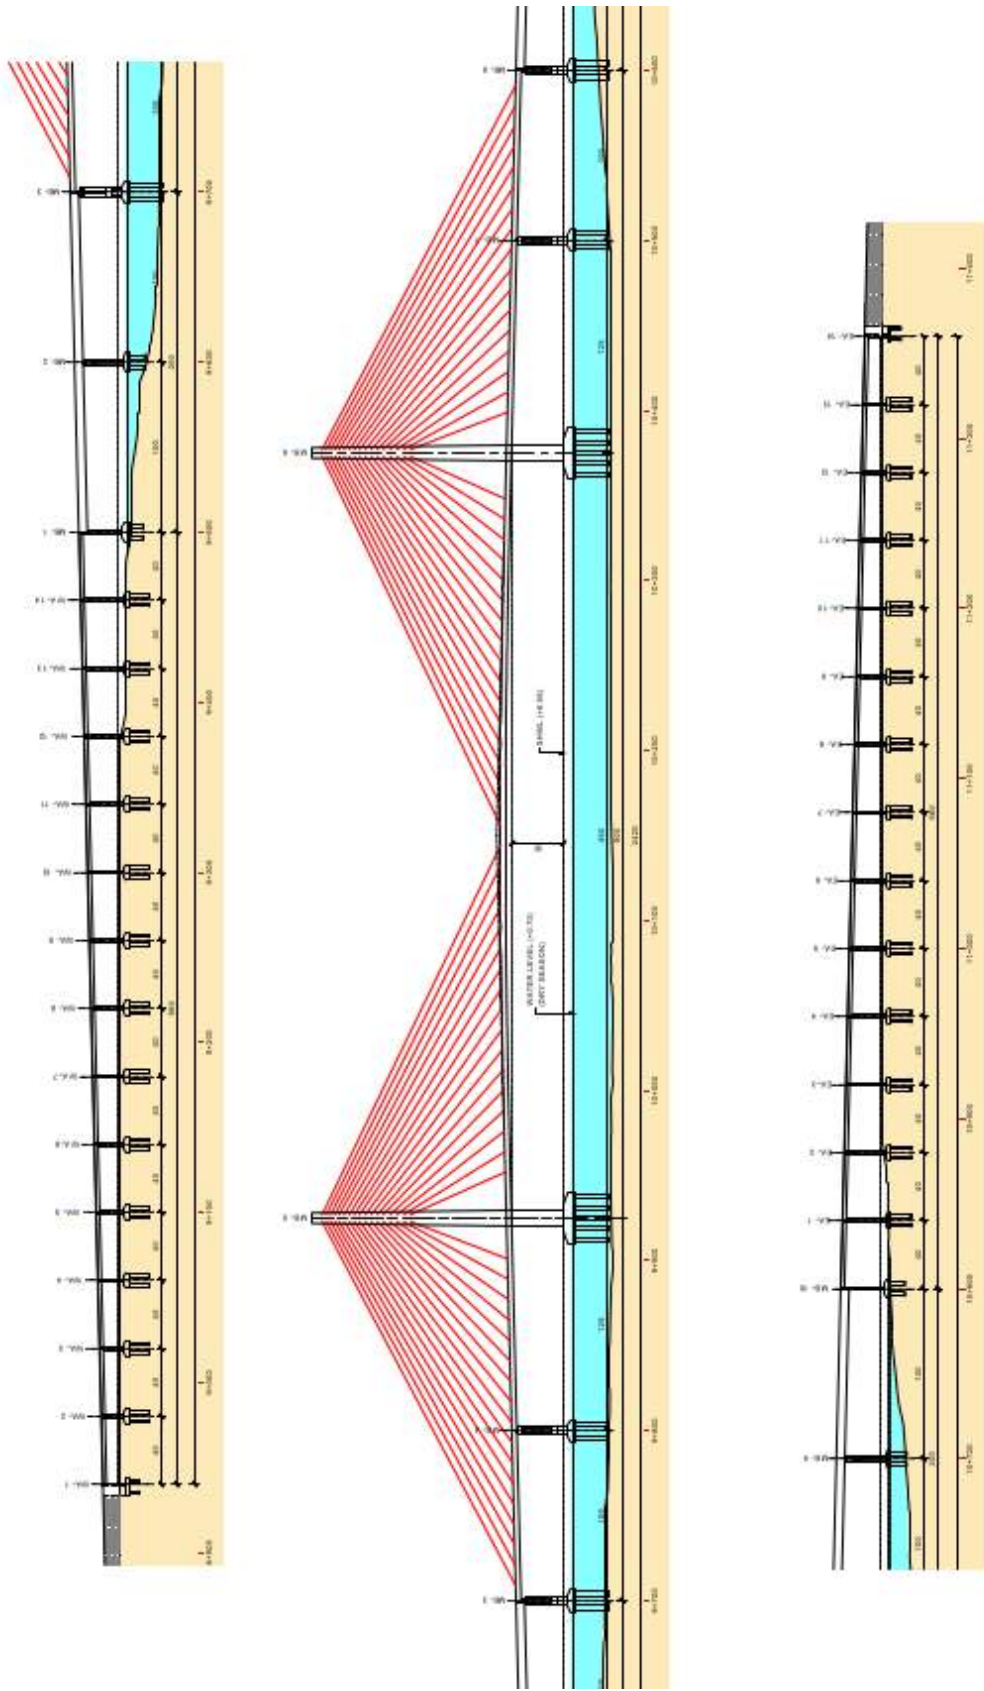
Elevation of the full bridge proposed for Gazaria-Munshiganj.
